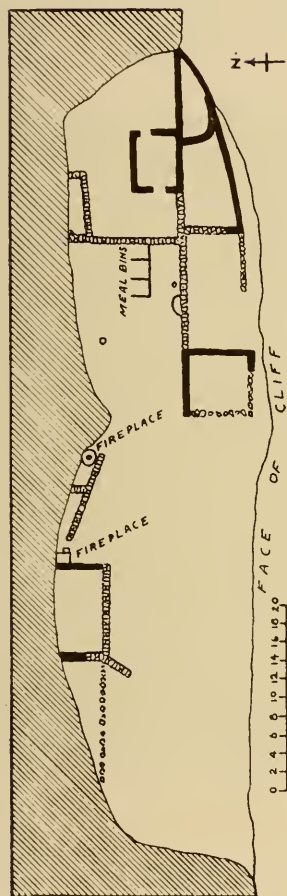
Ground plan of Upper Cave of Fire Temple House.
